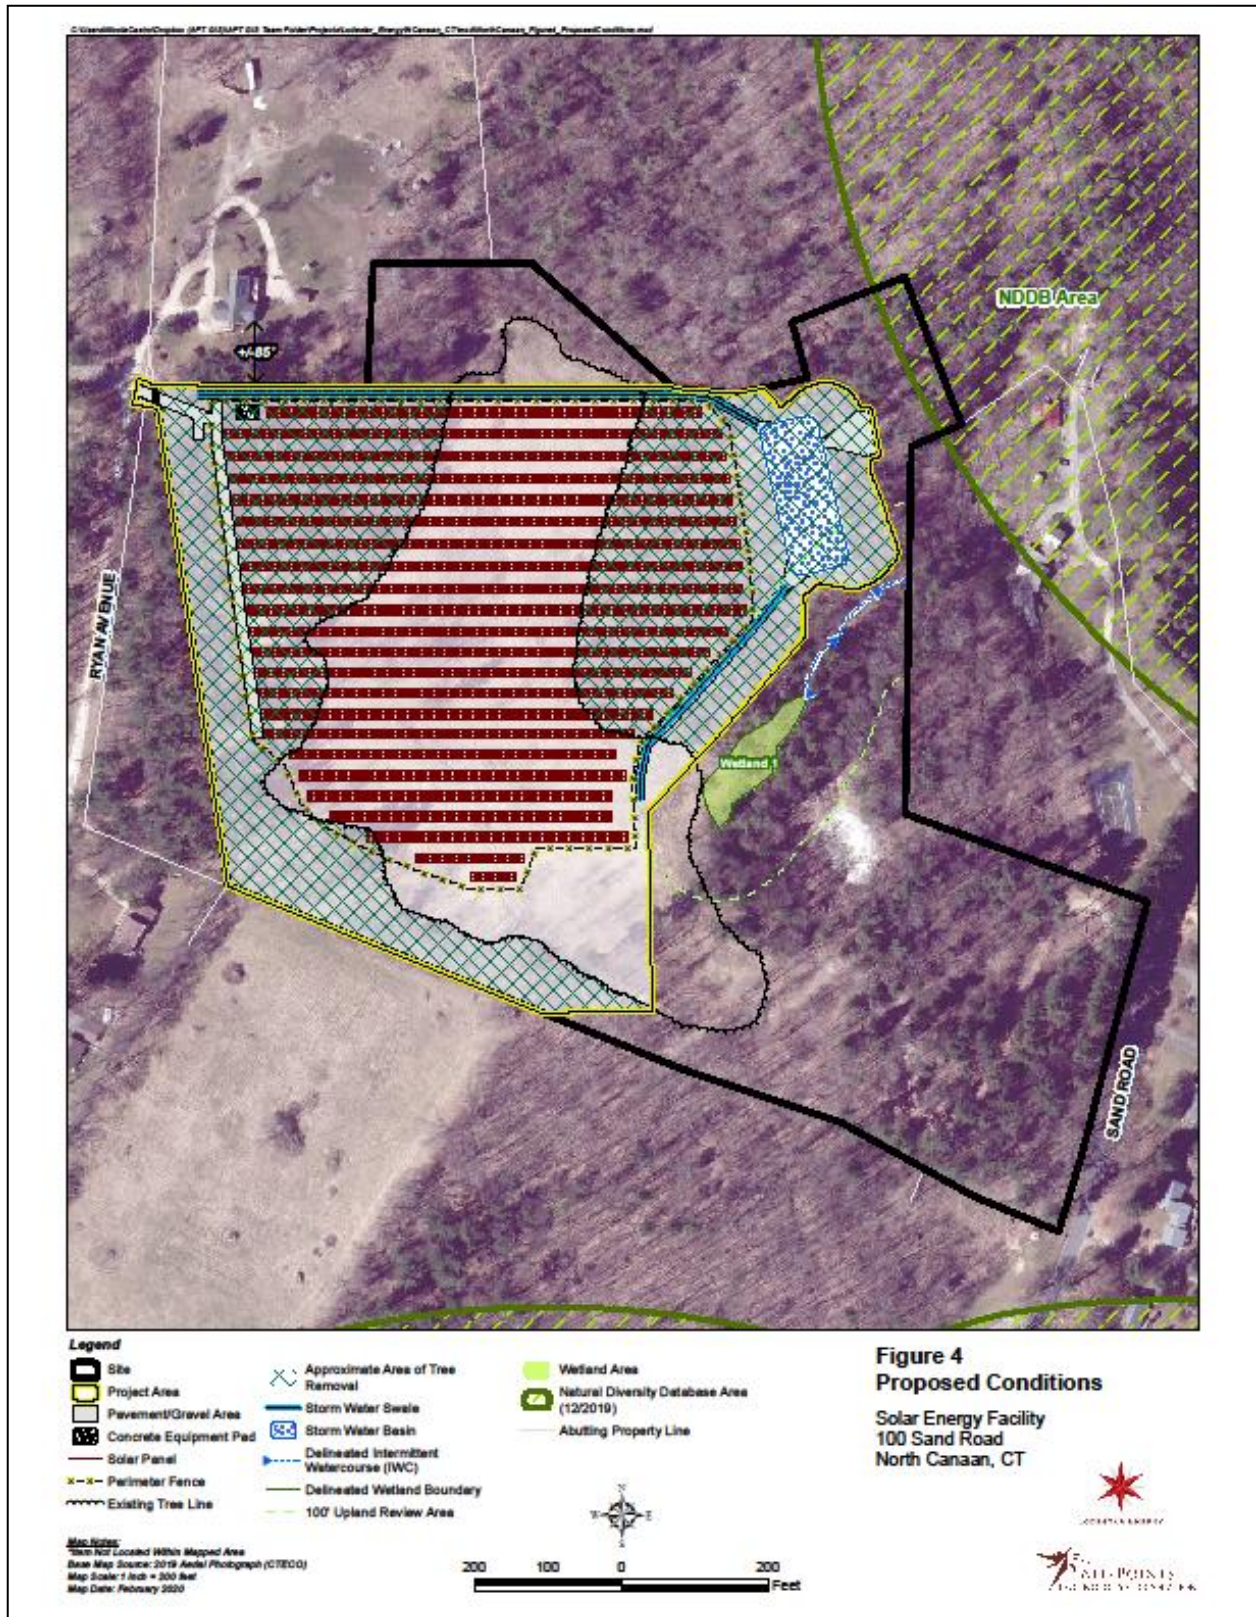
Project plans showing the proposed LSE Phoenix LLC Solar Center in North Canaan, Connecticut
